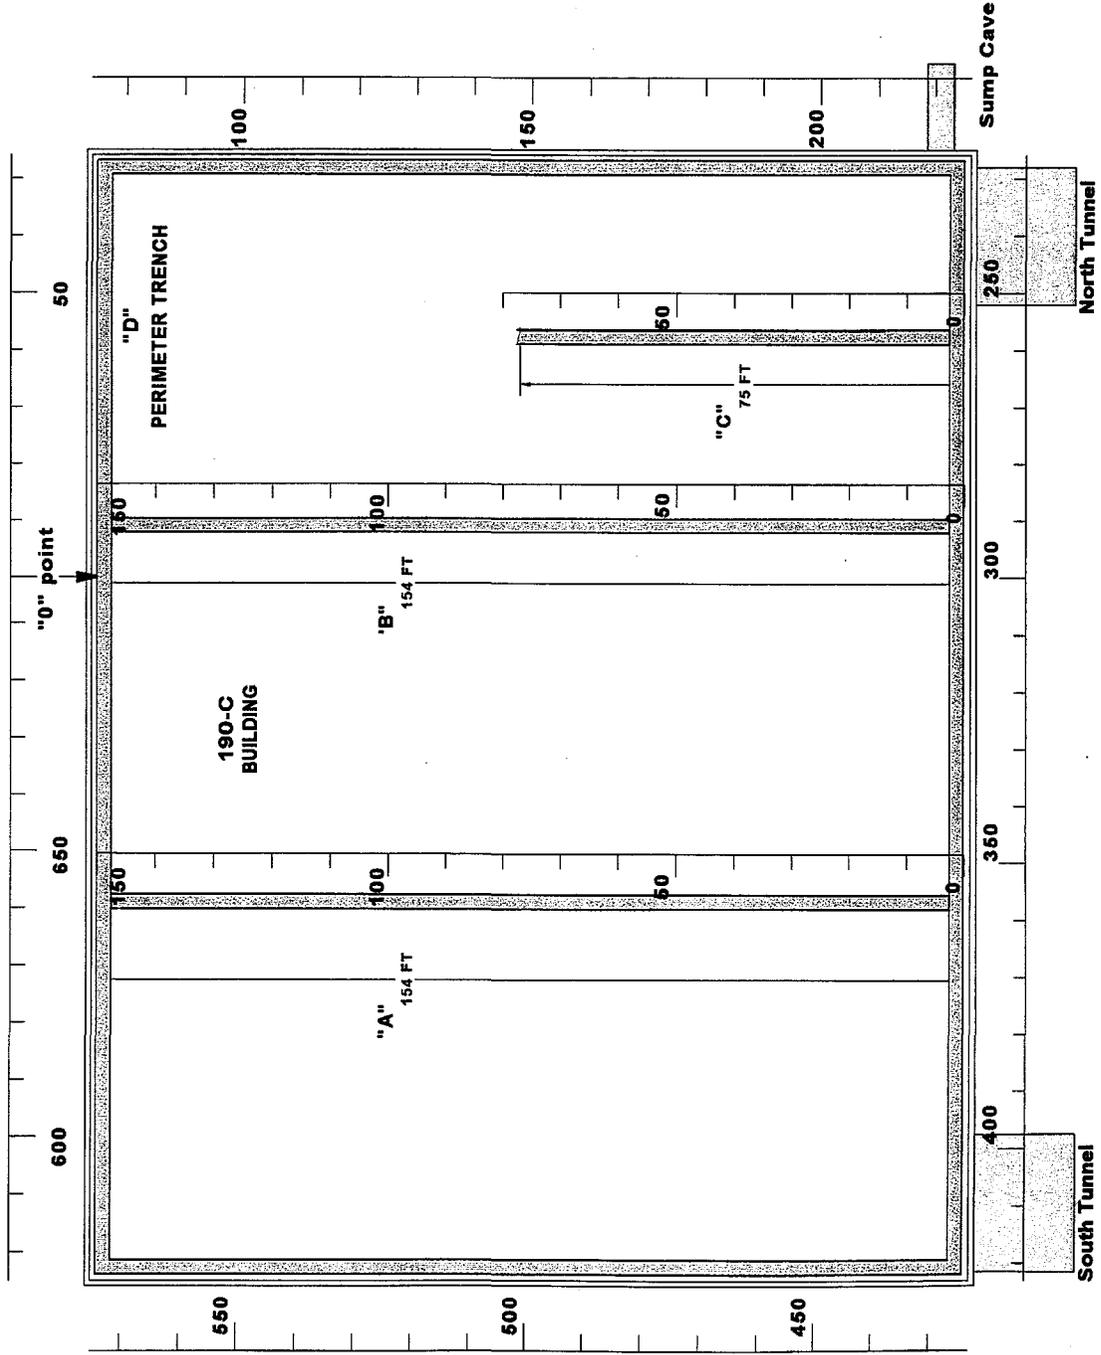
190-C basement trenches showing trench layout and reference grid.
